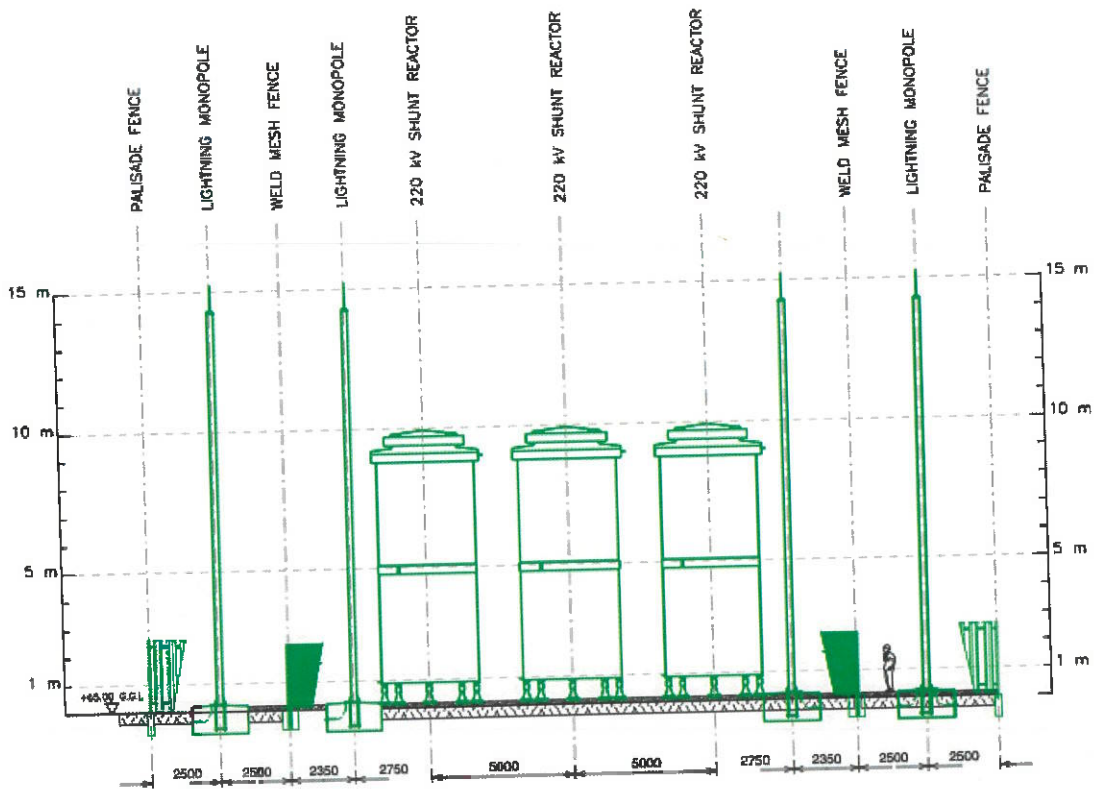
Elevation of proposed apparatus at the site measuring 10m in height
